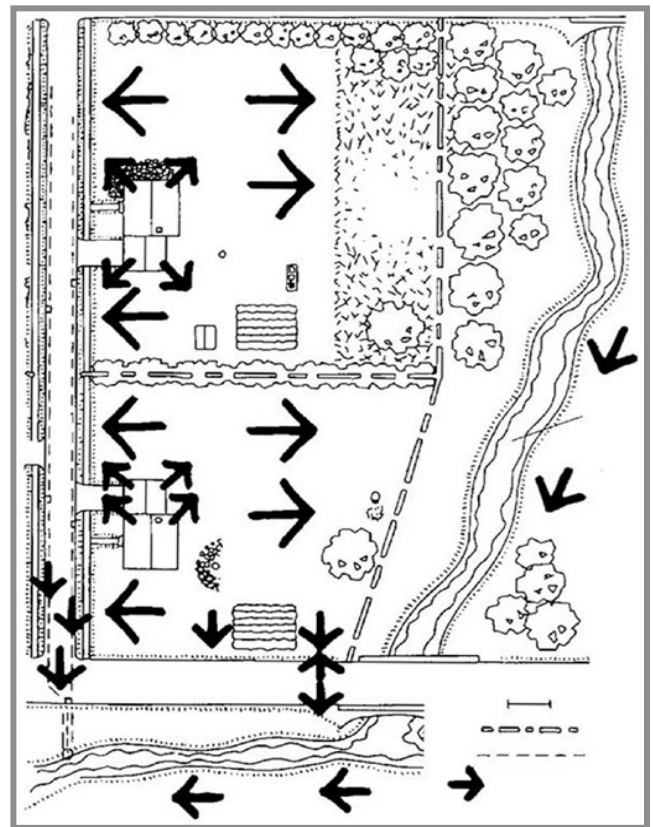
Simple site plan. Source: Shelton and Feehan 2008.
